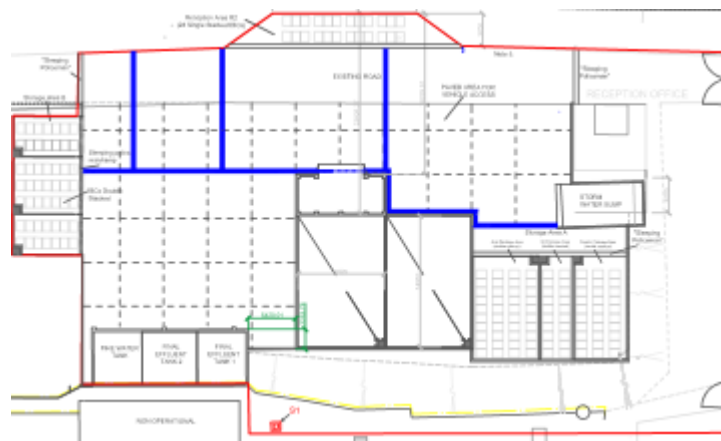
Proposed Site Layout (Extract from 109-CL-001 – Appendix B)
